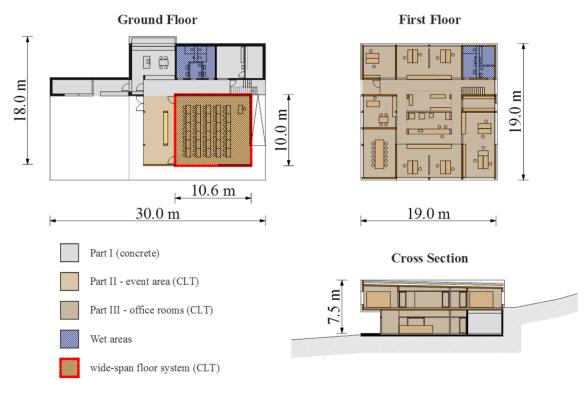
Floor plans and cross section of the preliminary draft [2]
